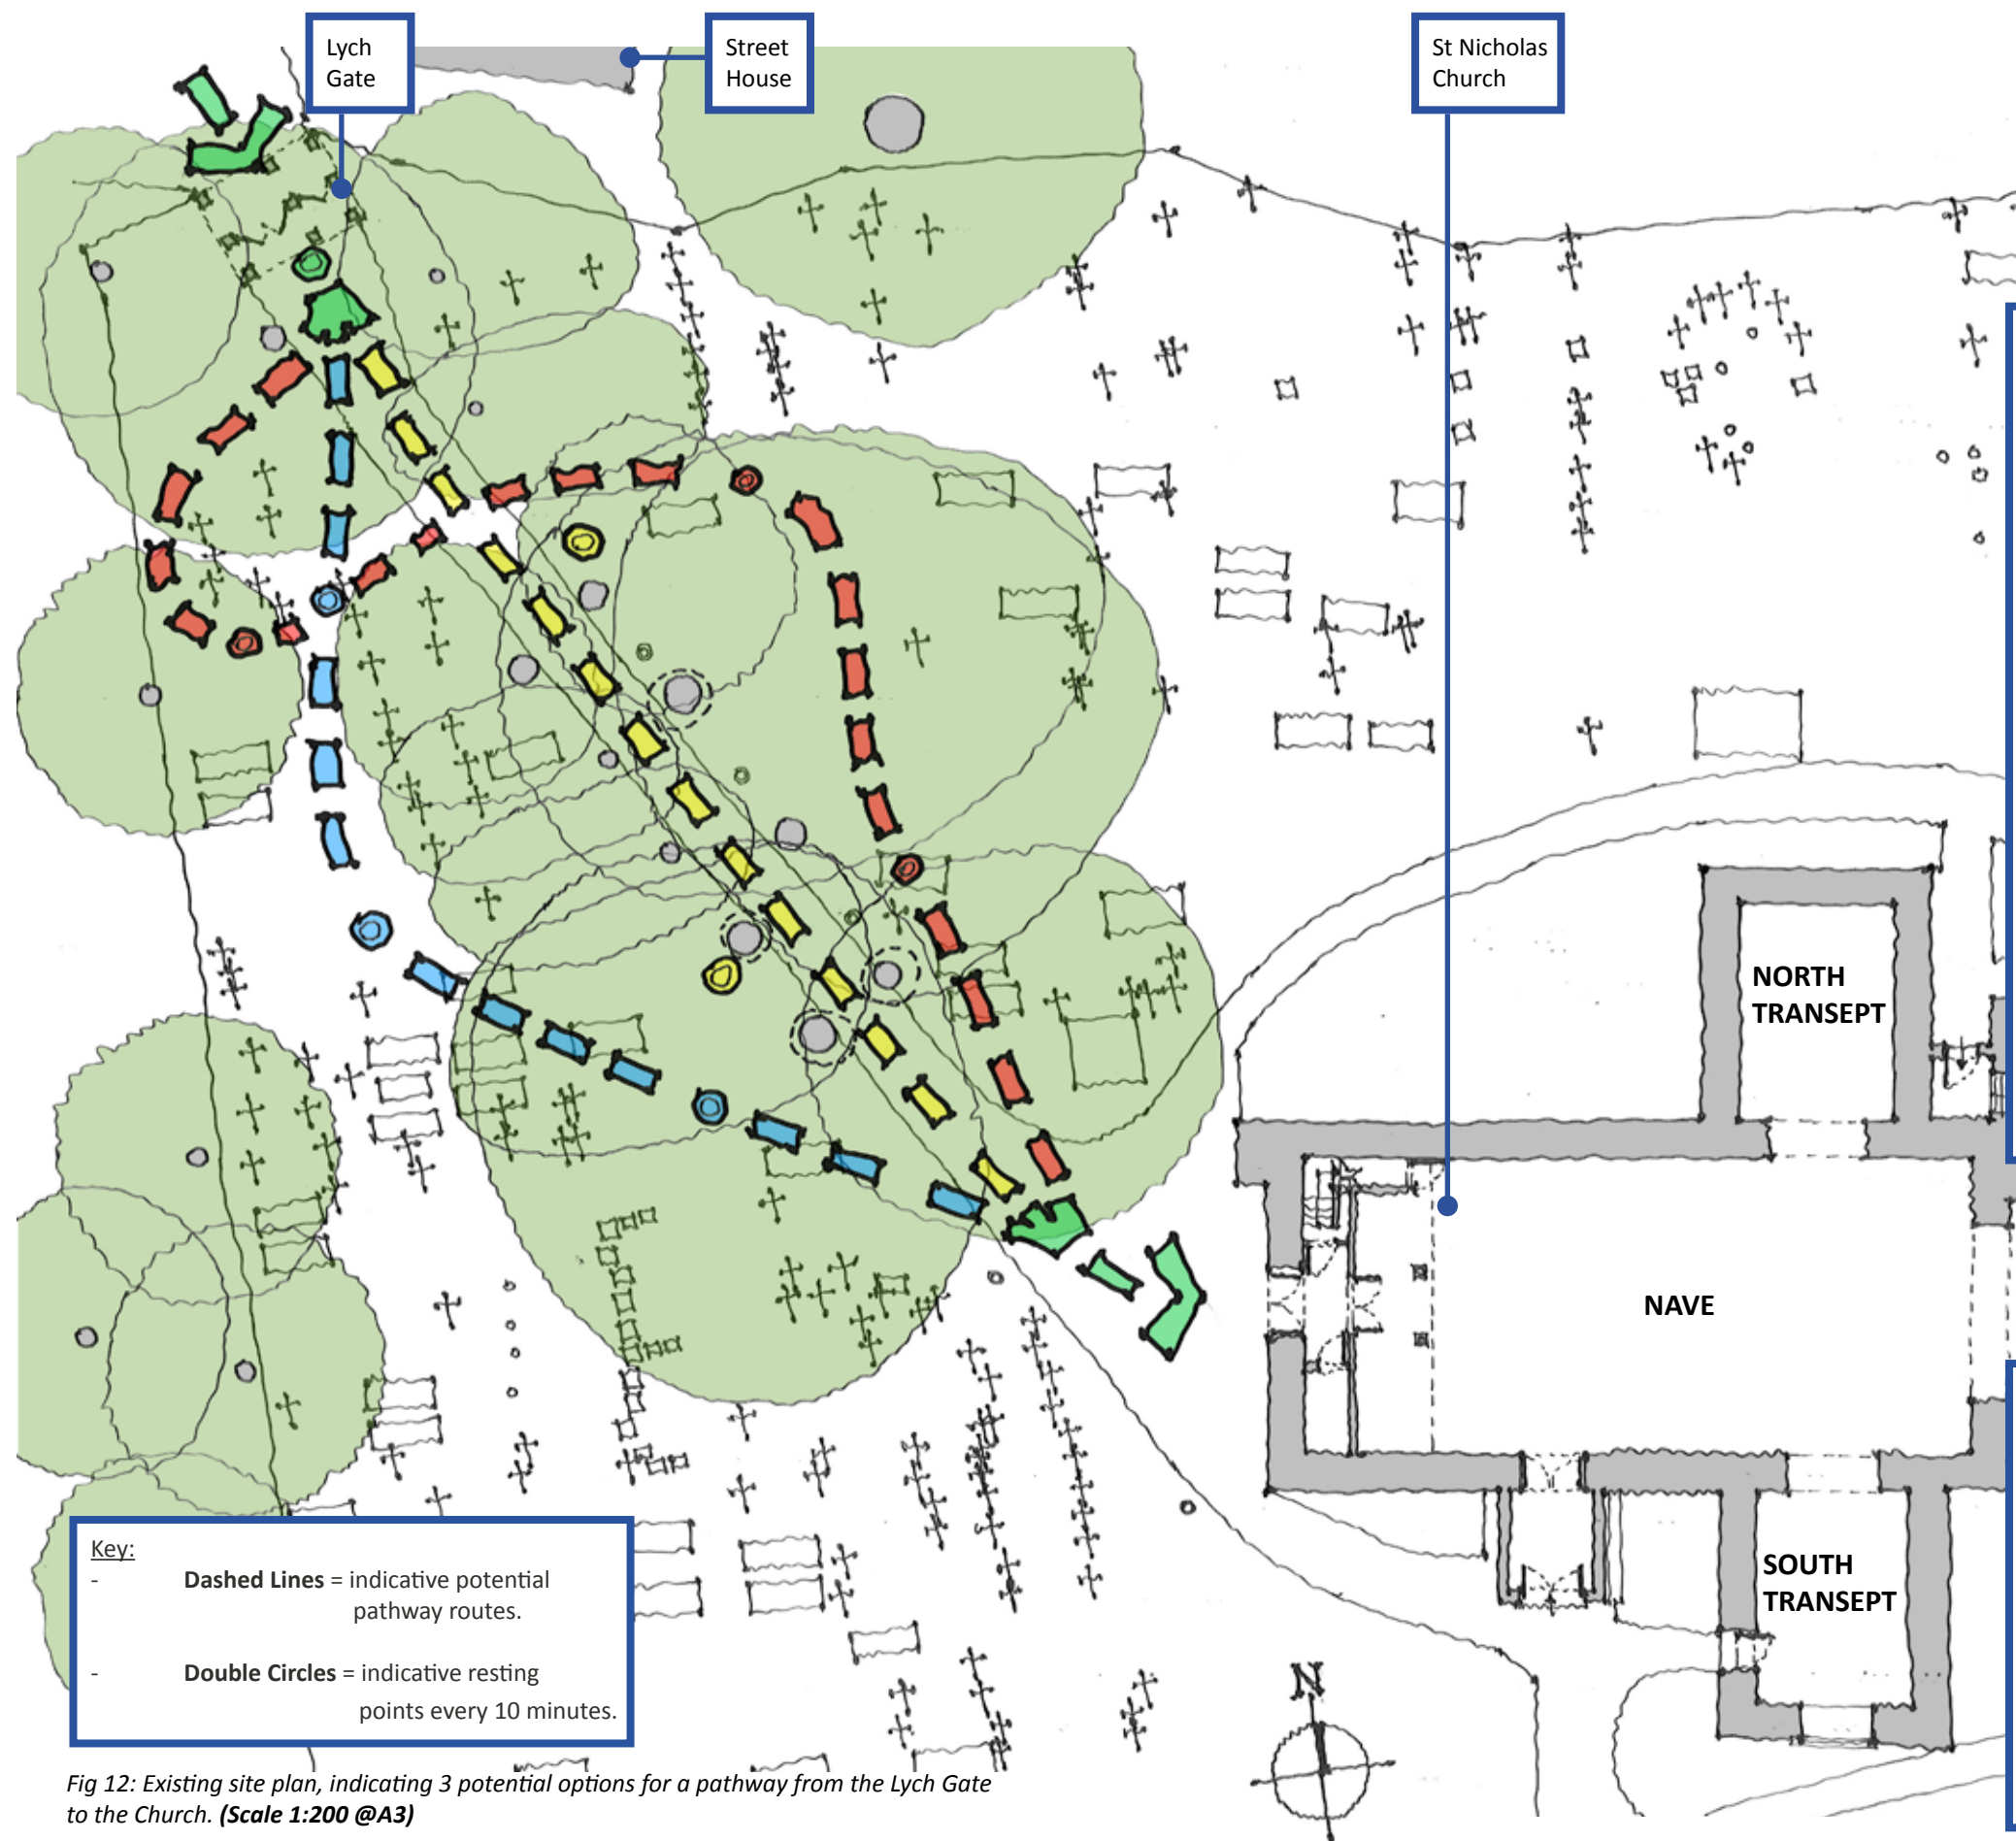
Existing site plan, indicating 3 potential options for a pathway from the Lych Gate to the Church. (Scale 1:200 @A3)
